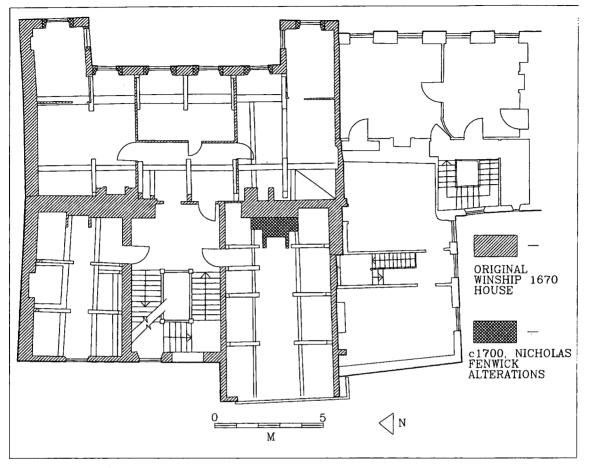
Alderman Fenwick's House: Third Floor Plan.
